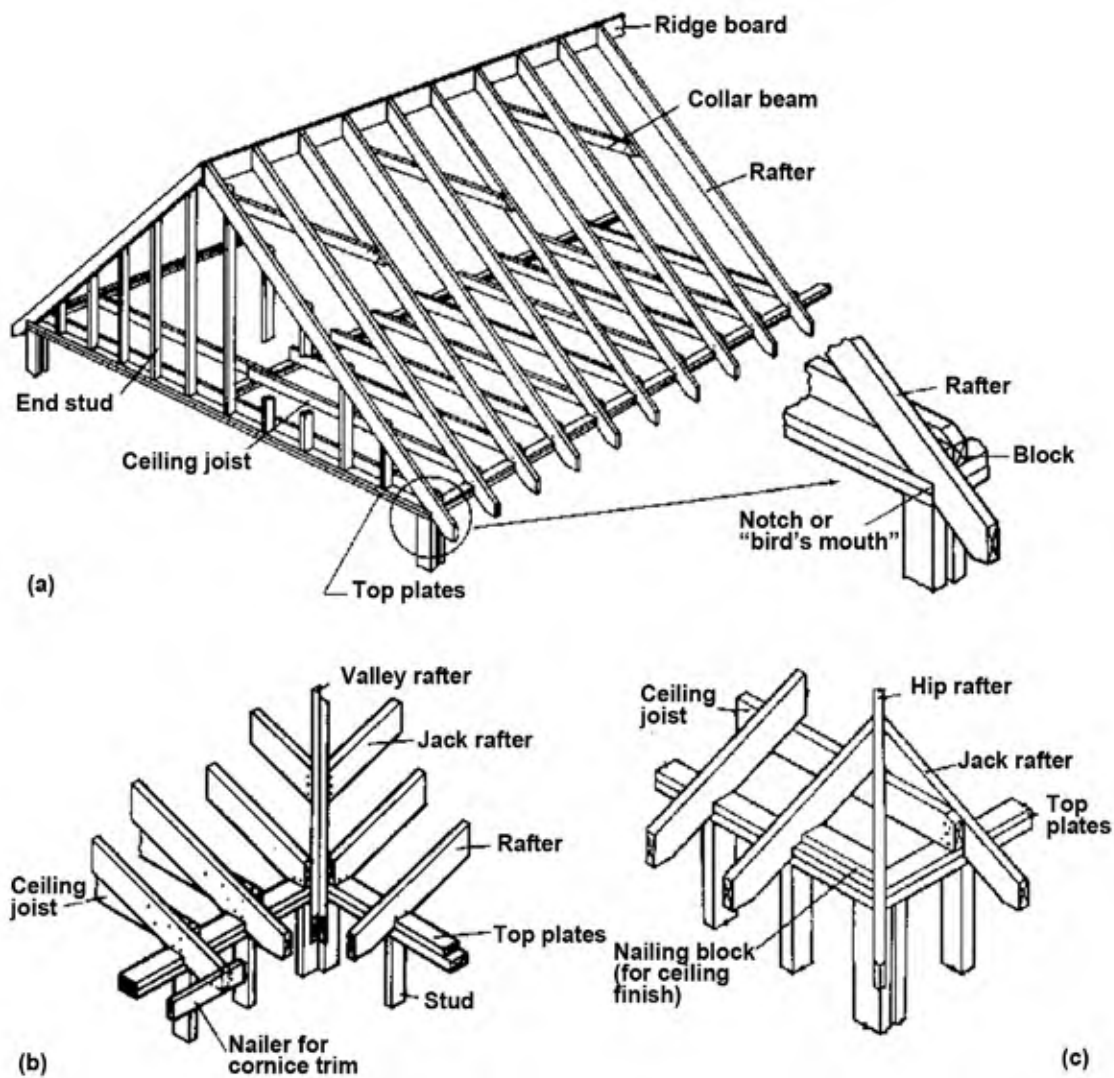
(a) A rafter-type roof with typical framing details for (b) a valley and (c) a hip corner.
